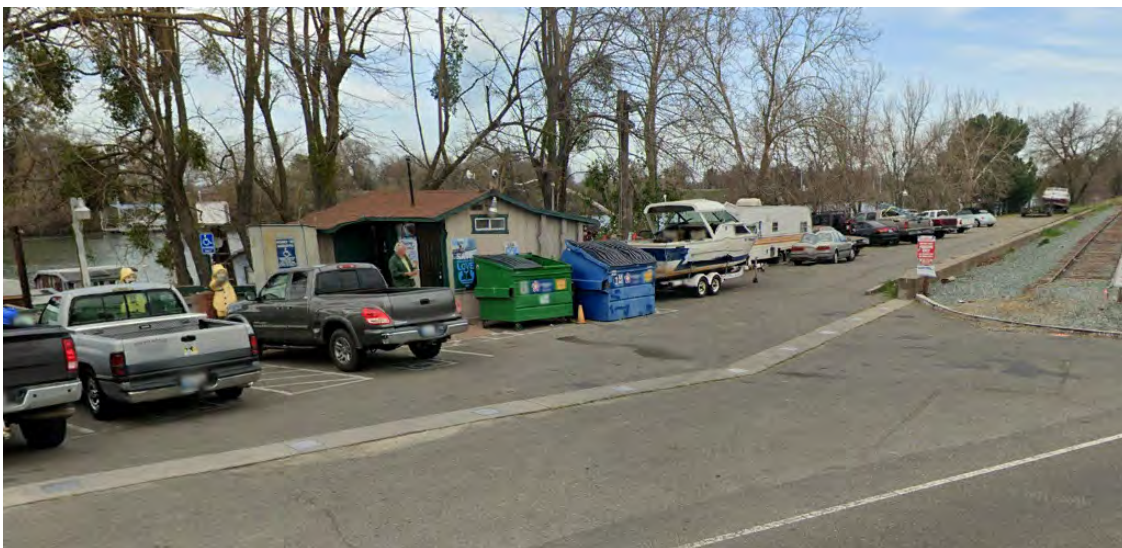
Existing flashboard at Cliff's Marina on the SREL. The concrete foundation and steel sleeves can be seen running through the parking lot. Steel posts are placed in the sleeves and boards are added to function as a temporary flood wall during flood events. Source: Google Earth.
